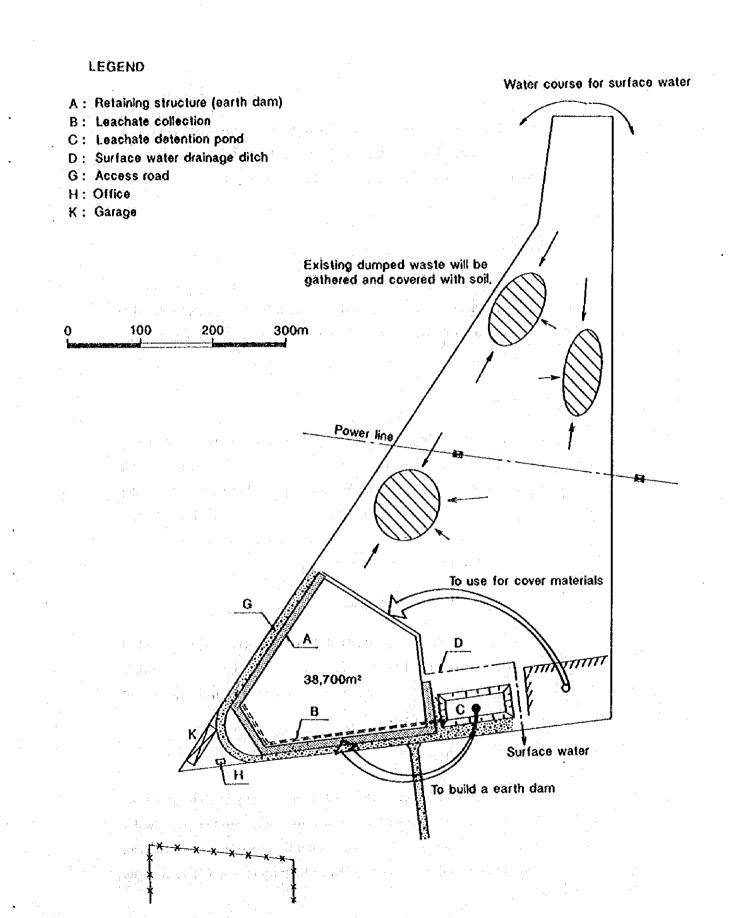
Standard Section View of the Facility Layout of the Landfill Site (Scale = 1:200)
